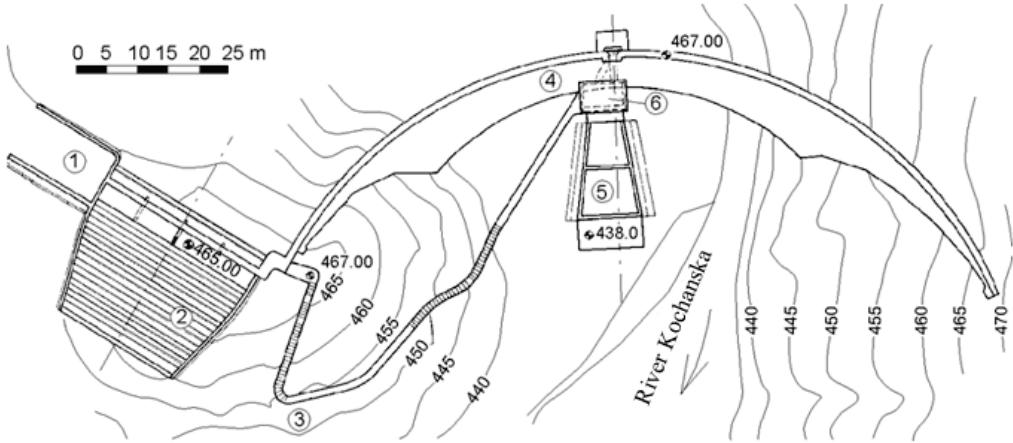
Gratche dam, layout. (1) Plateau; (2) spillway; (3) roadway; (4) the dam's body; (5) stilling basin at the bottom outlet; (6) gate chamber at the bottom outlet.
